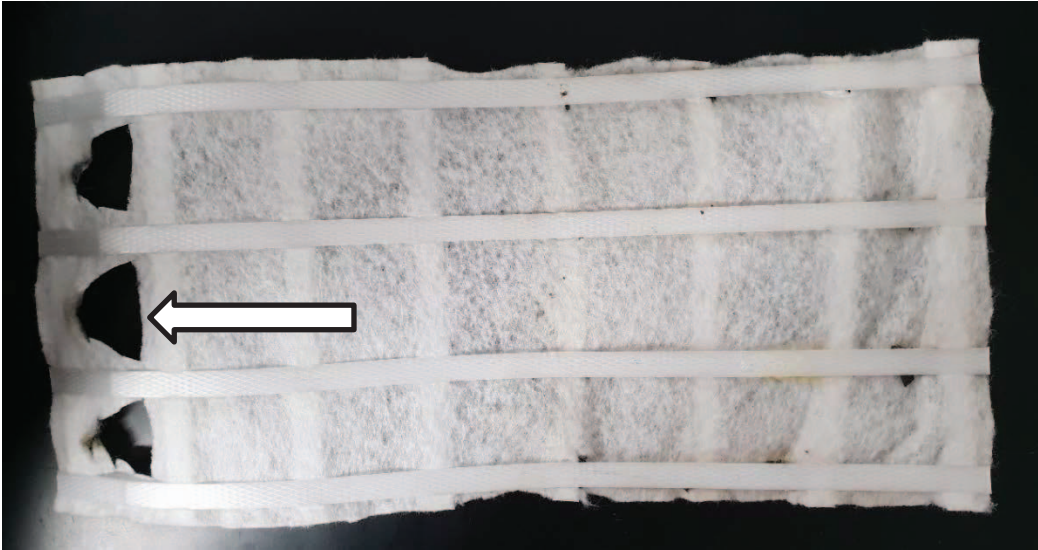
Geocomposite sample showing holes for screws to pass through for clamping attachment
